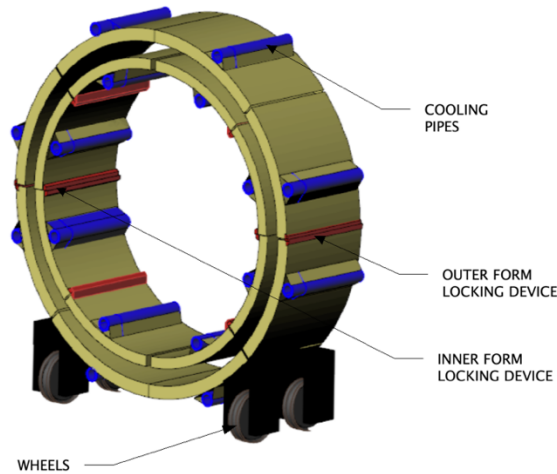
Standard wheeled Ring-mold composed of modular arch forms.
